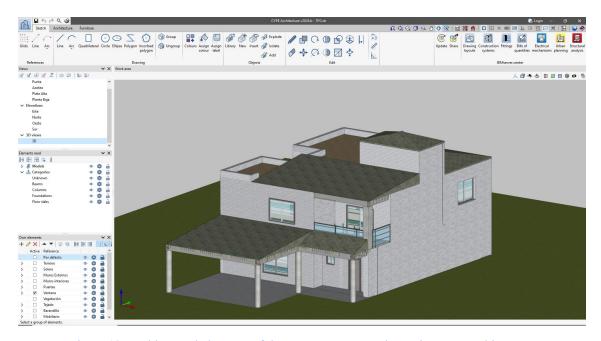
Architectural elements of the concrete structure house in Cype Architecture.
